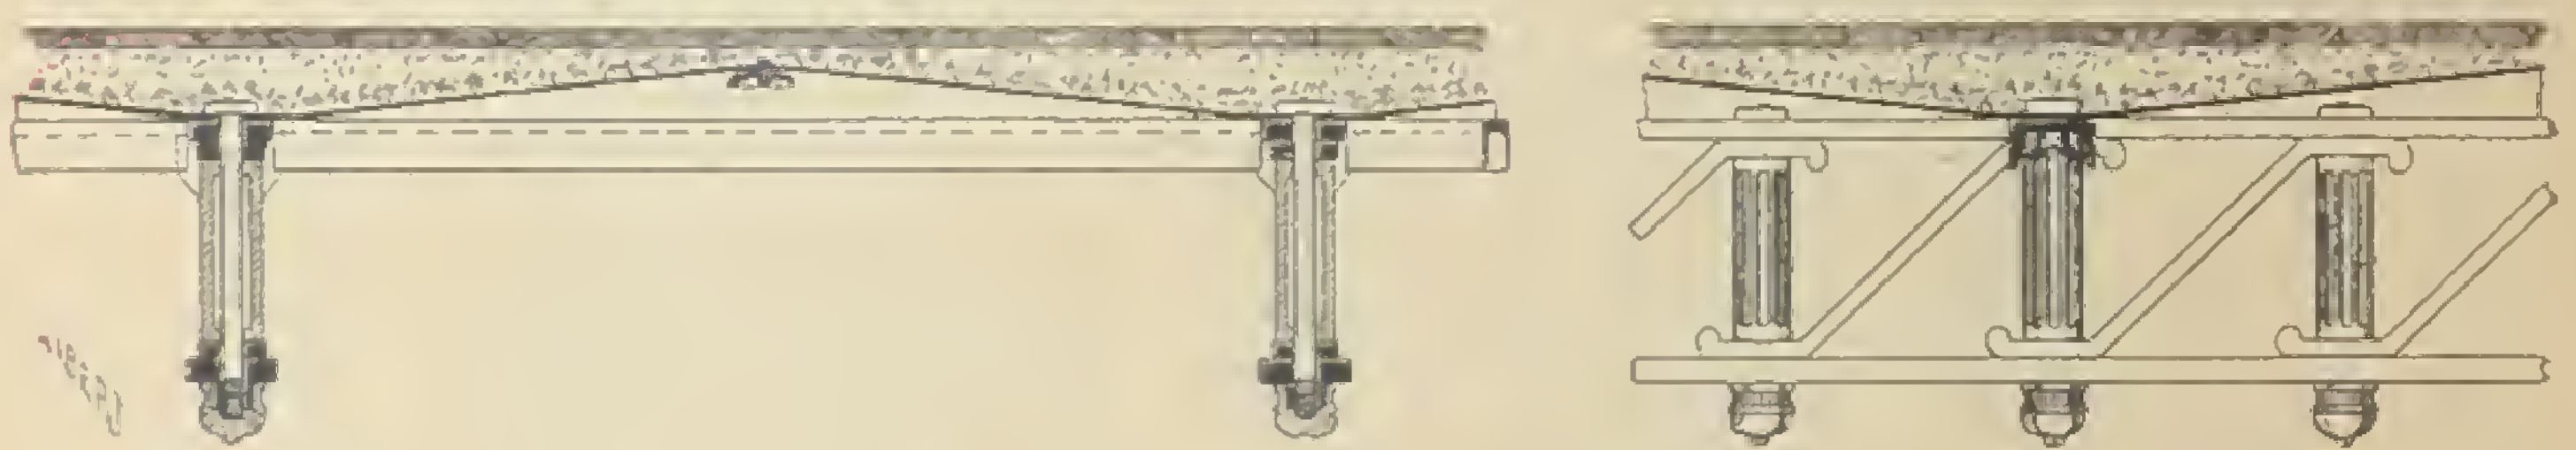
Fire proof ceiling paved and covered with linoleum.
